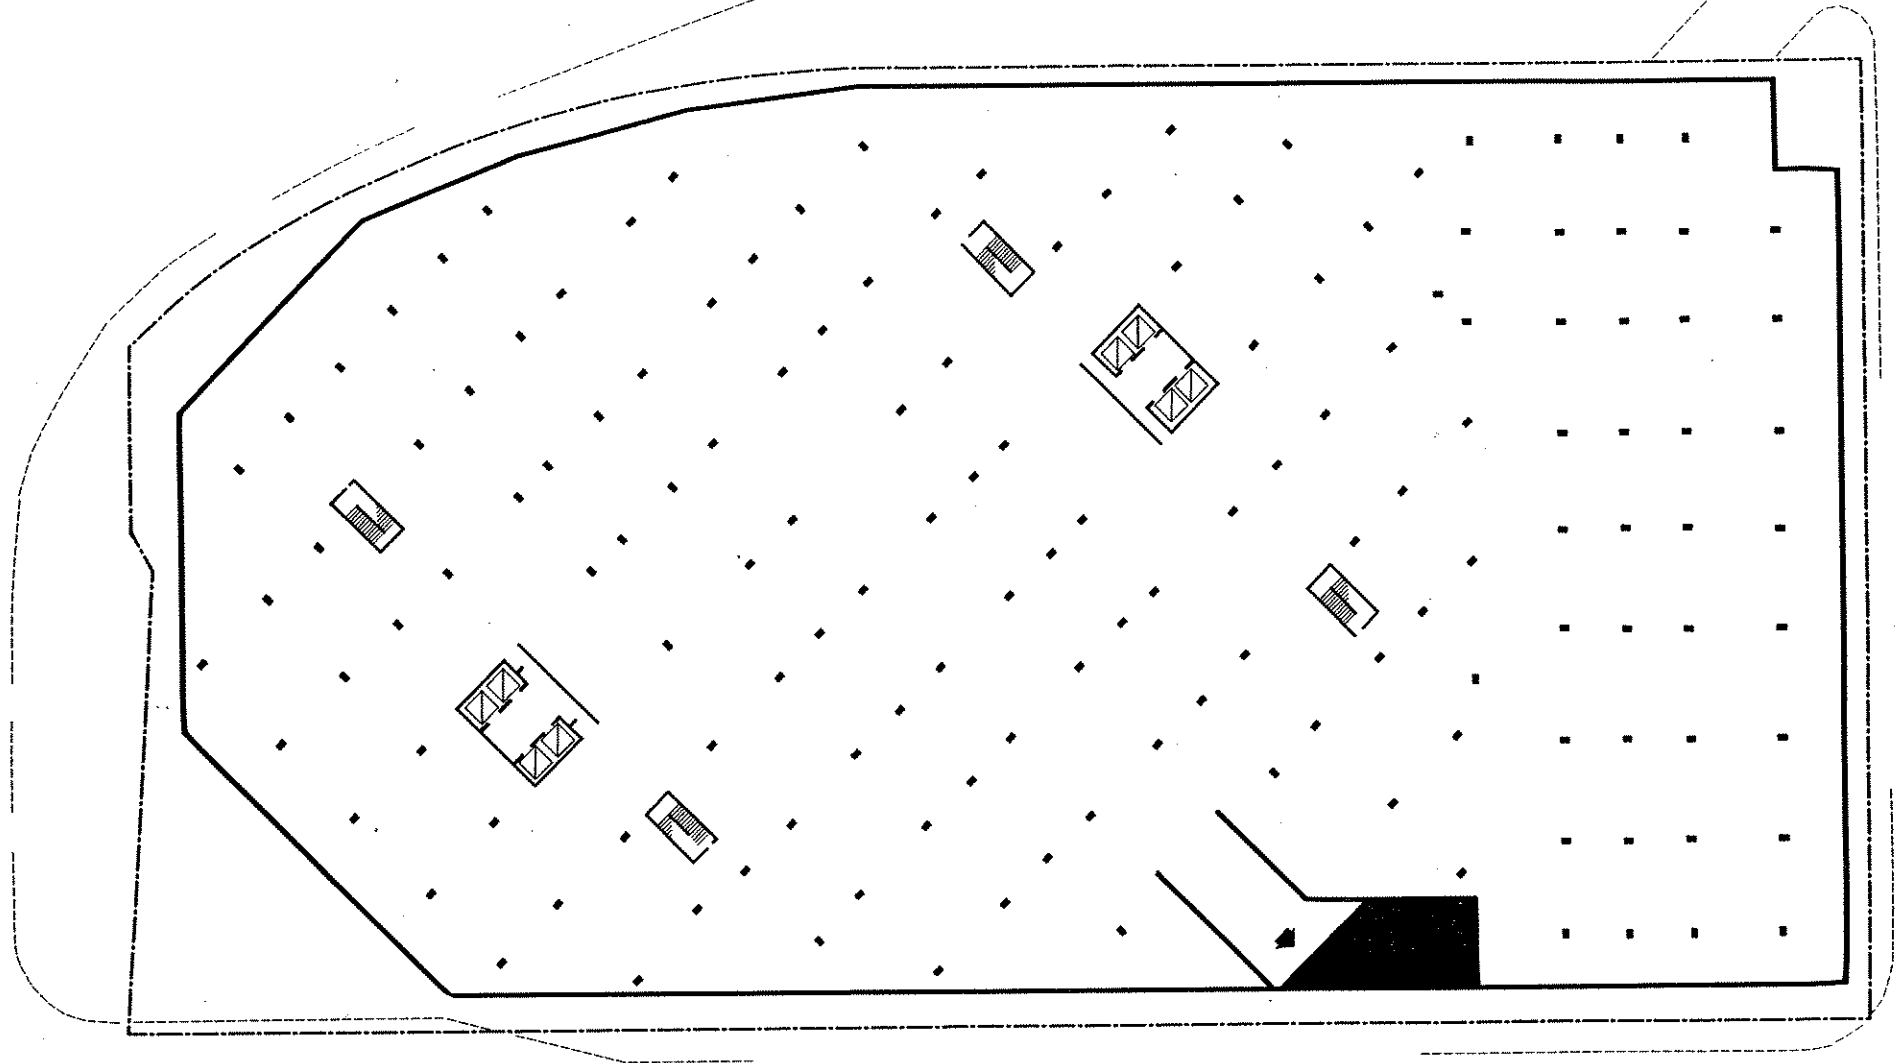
A BUILDING ELEVATION FLOOR PLANS
